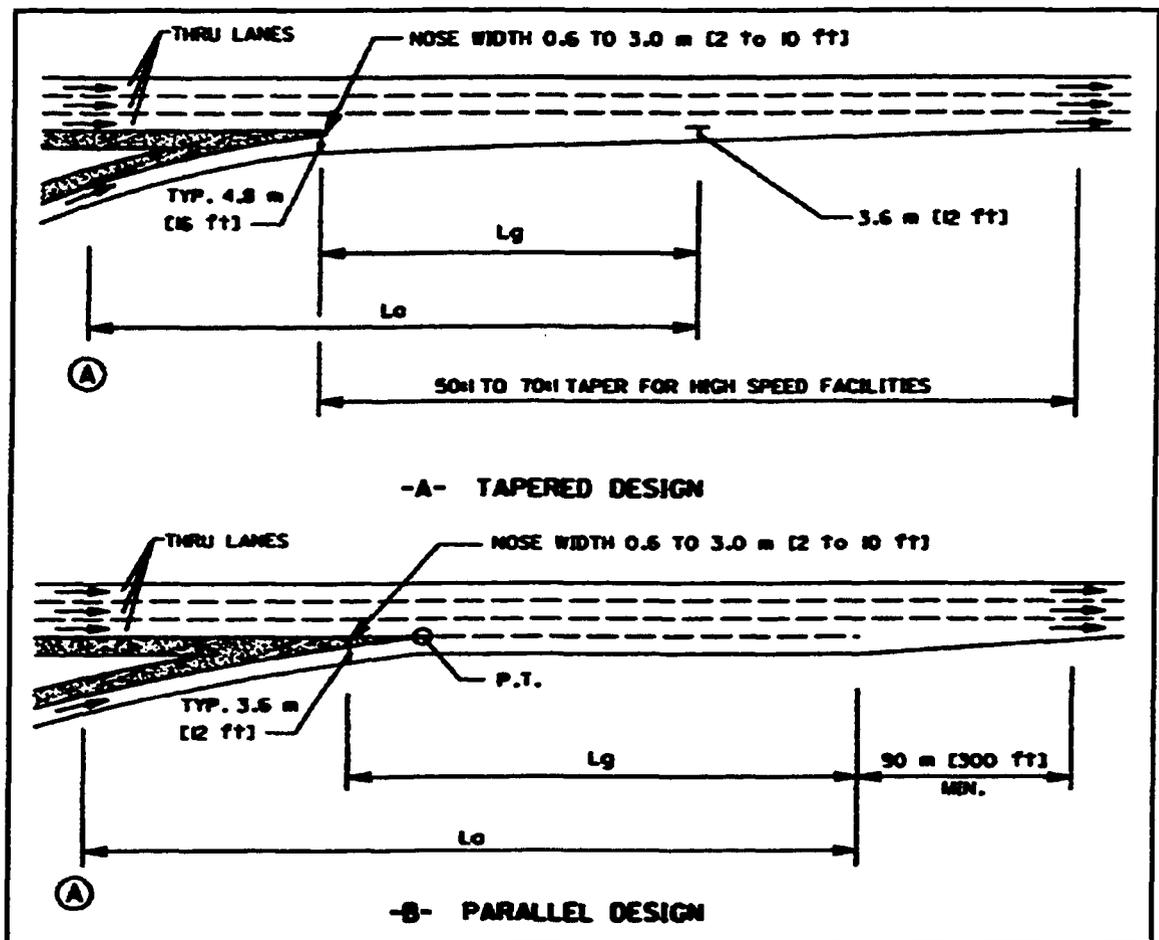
Typical Single Lane Entrance Terminal (AASHTO 2001, Exhibit 10-69)
